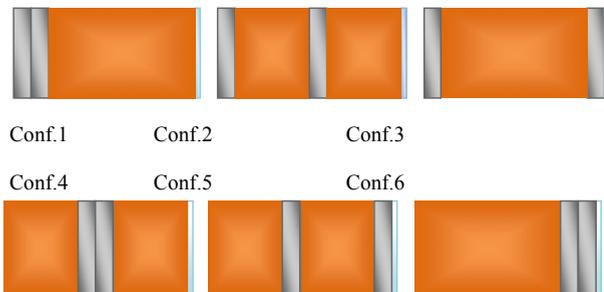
Six possible wall configurations using two masonry material layers, two insulation layers and one gypsum layer
